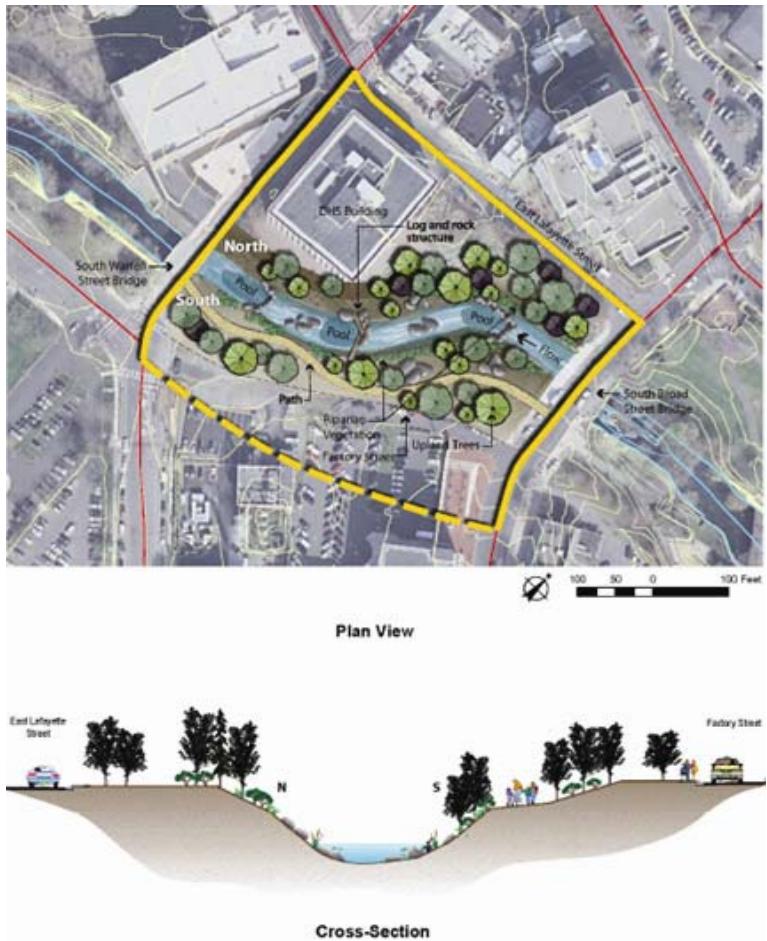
USACE Assunpink Creek Culvert Day Lighting Project Concept
